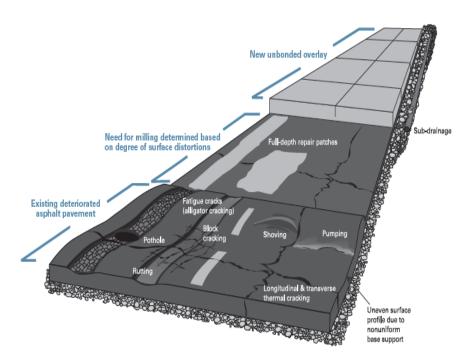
Notable distress on existing pavement and possible repairs for thick whitetoppings [4]
